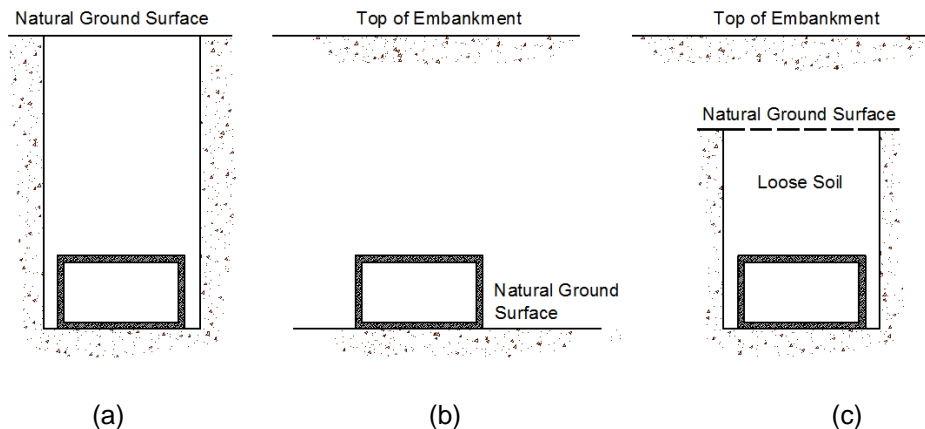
Types of Conduit Installations: a) Trench Conduit, b) Positive Project Conduit, and c) Negative Project Conduit (Adapted from Marston, 1930)
